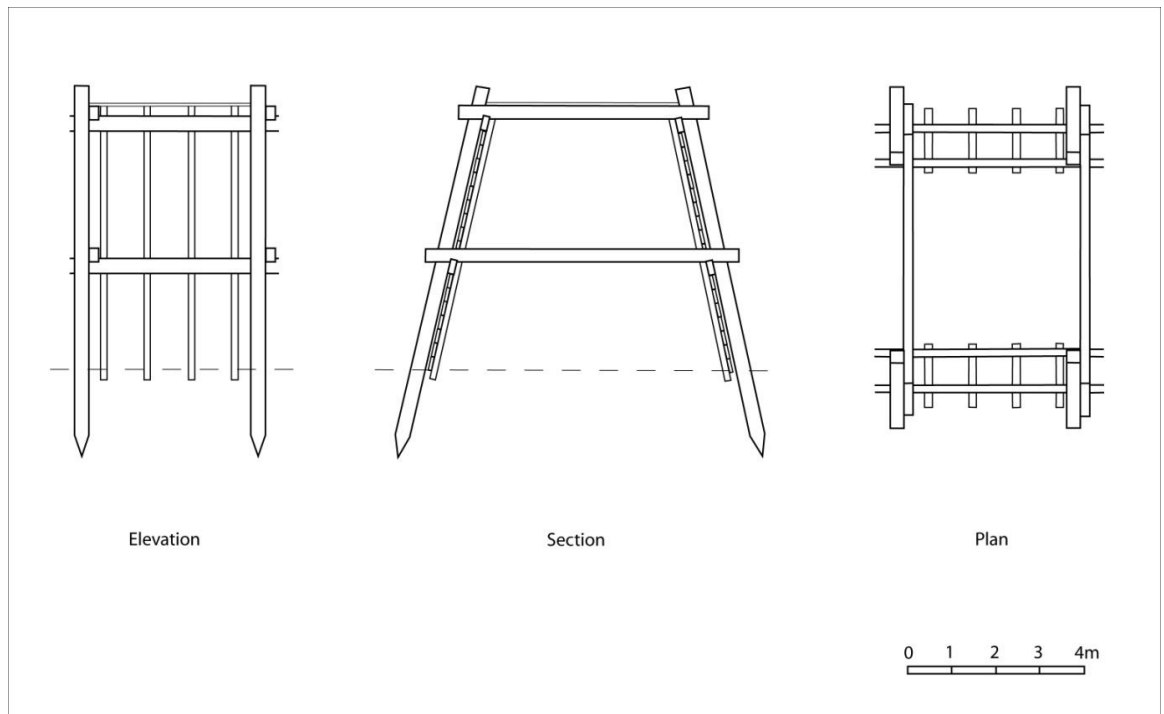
, Reconstruction of a typical bay unit, post 1719 piers, Bridlington: elevation, section and plan (for ease of visual clarity the horizontal timber plank cladding is omitted from the elevation and plan) (From Johnson 2008)
